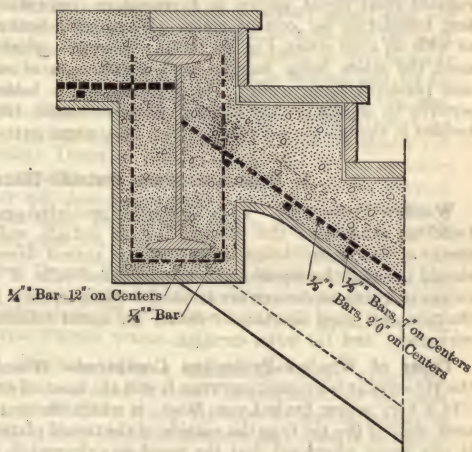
Reinforced-concrete Stairs, Government Printing Office, Washington, D. C.
